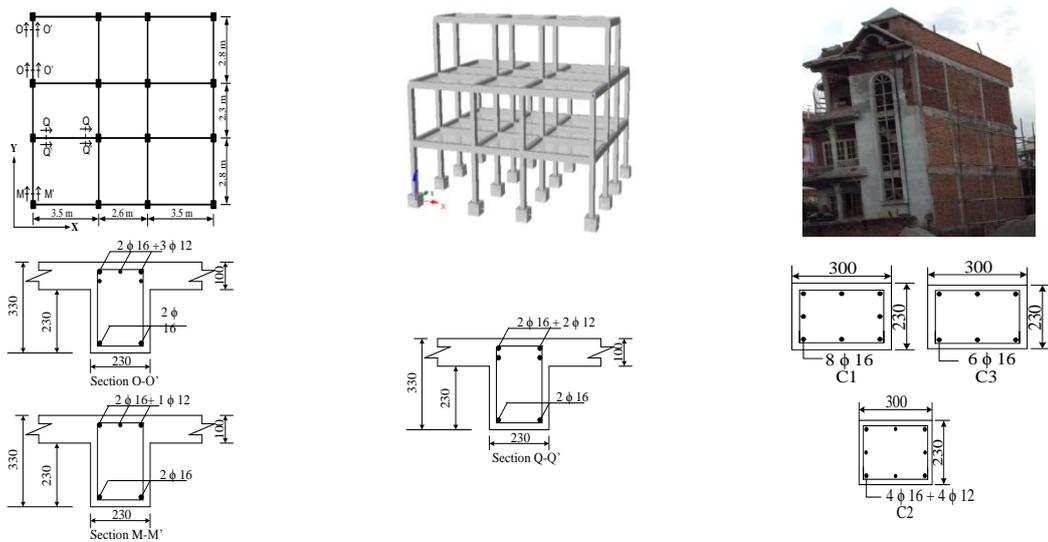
Plan, tridimensional model, and cross-section detailing of building model RC3
